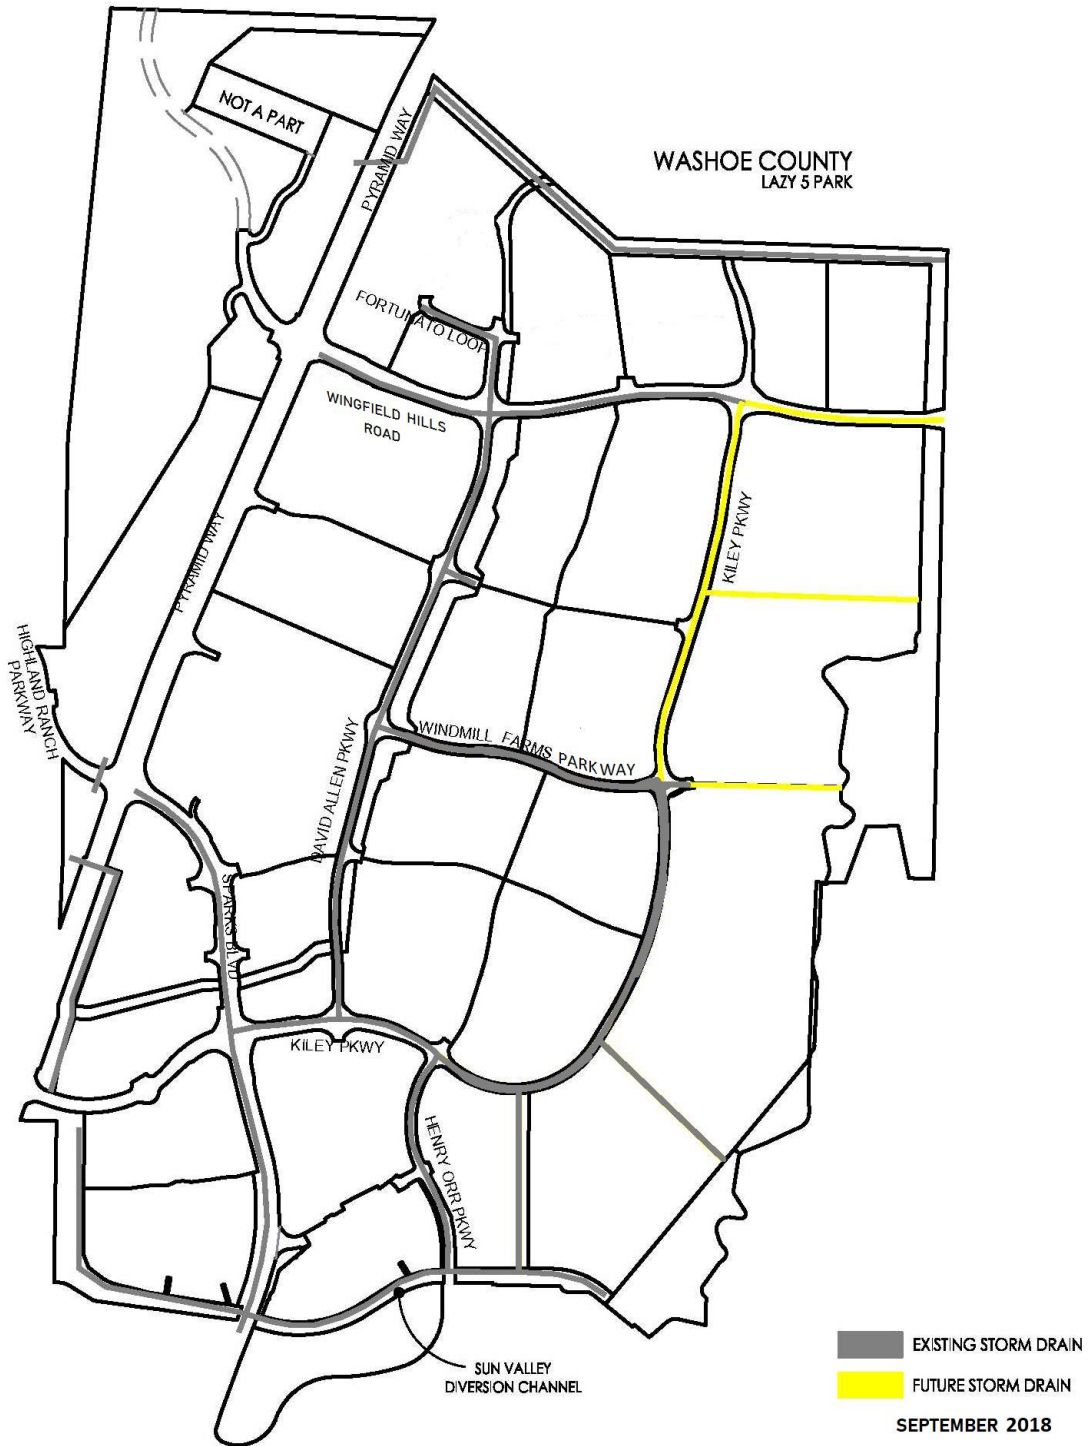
Existing and Proposed Storm Water Management Facilities
